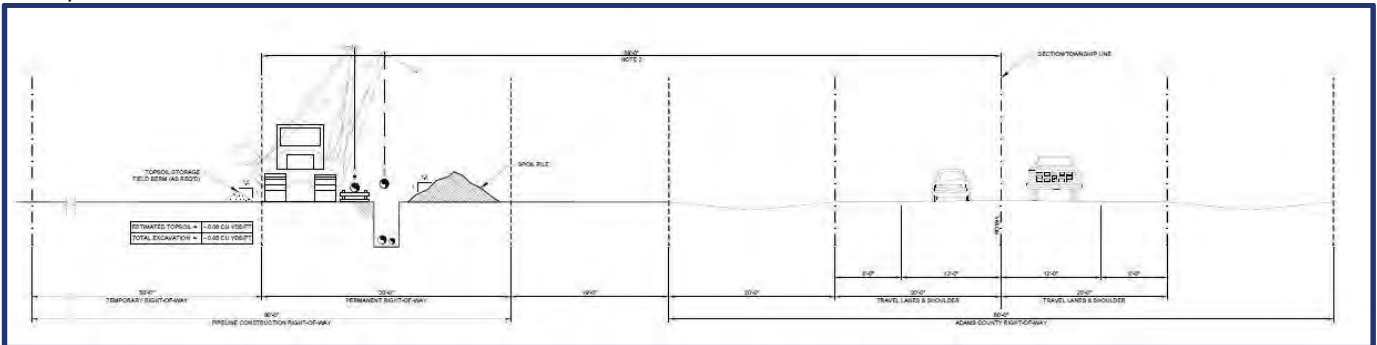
Potomac Street ROW Ditch Profile, Collector (Rural)
